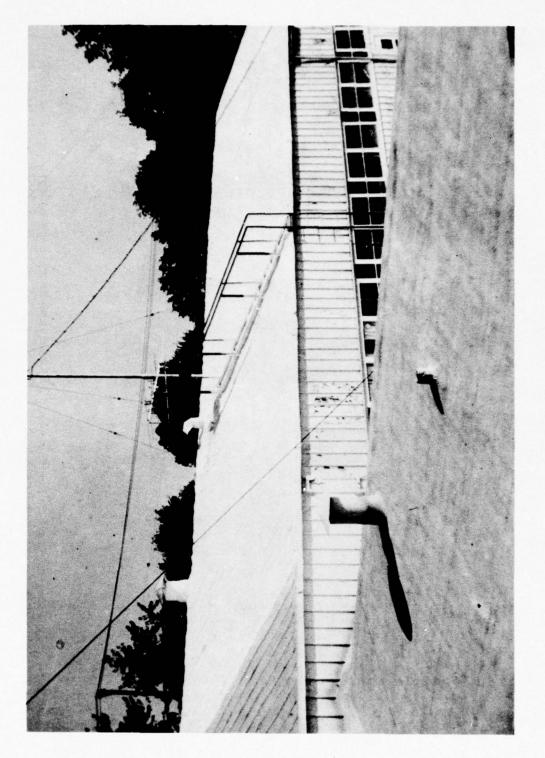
Completed South Side of Moisture-Curing Silicone Rubber Coating Section (System 2)
